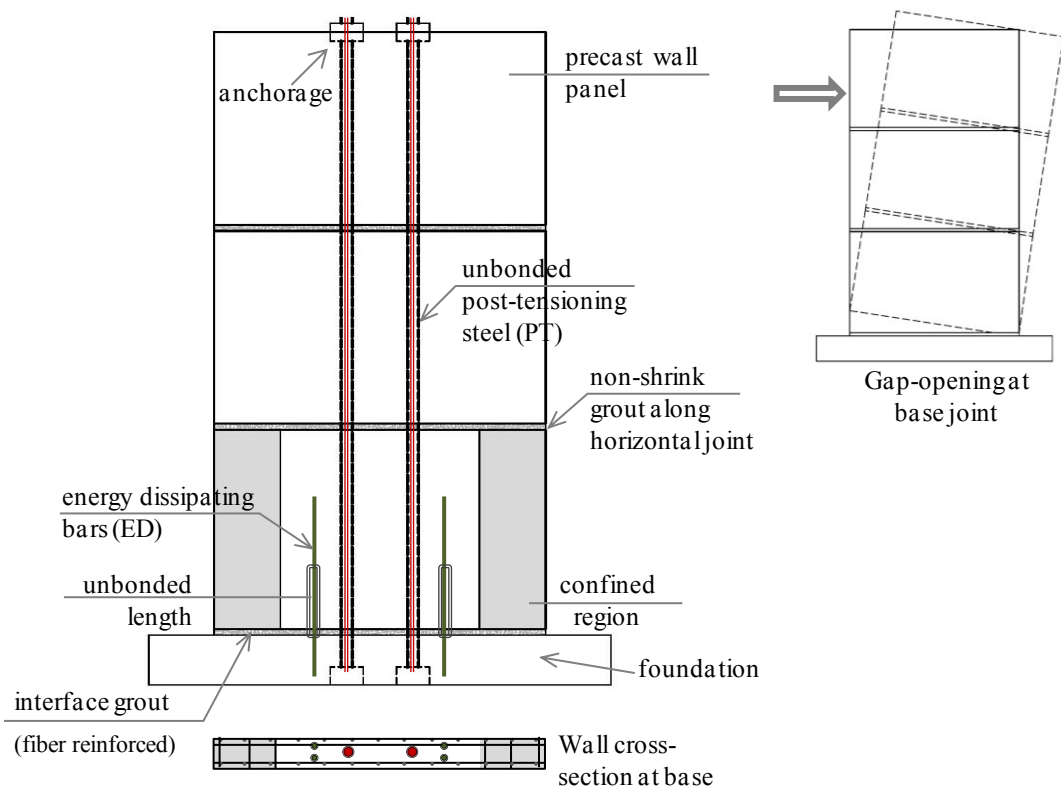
Main features of Unbonded Post-Tensioned (UPT) precast concrete wall
